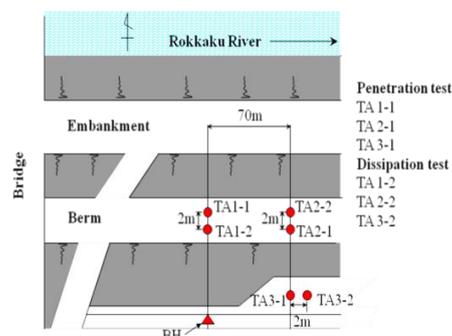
Plan layout of field tests (after Chai et al. 2004)
